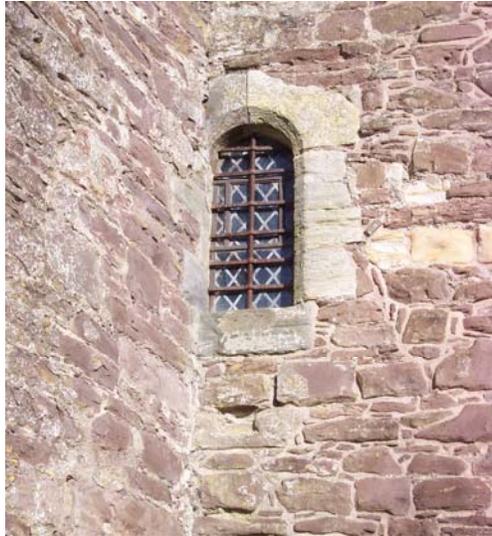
Detail - sill of the early arrow-slit below an inserted window at the re-entrant of the entrance tower and the E curtain wall, looking NNW
